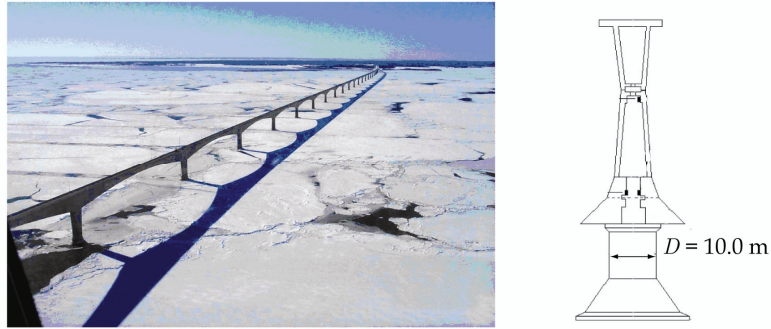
The Confederation Bridge with an instrumented bridge pier (Lemee and Brown, 2005).
